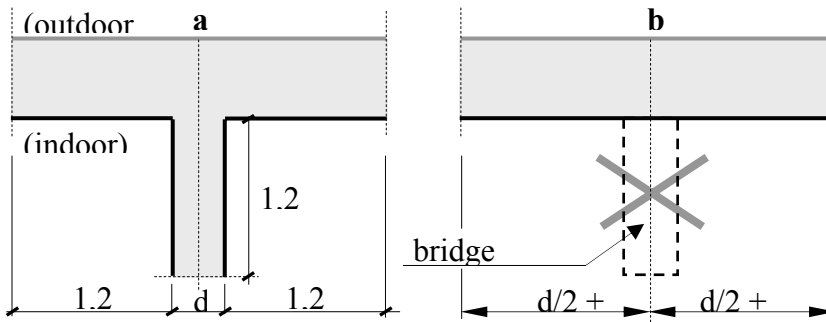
Thermal bridge situated at the intersection of one external wall with an internal one
